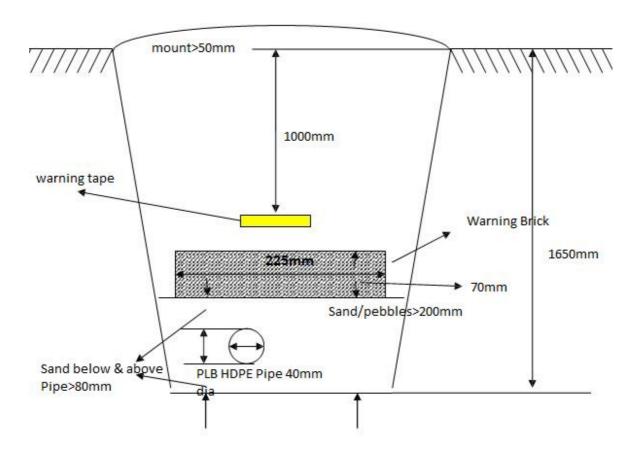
Trench in Normal Soil for 1 PLB HDPE pipes (Not To Scale)
